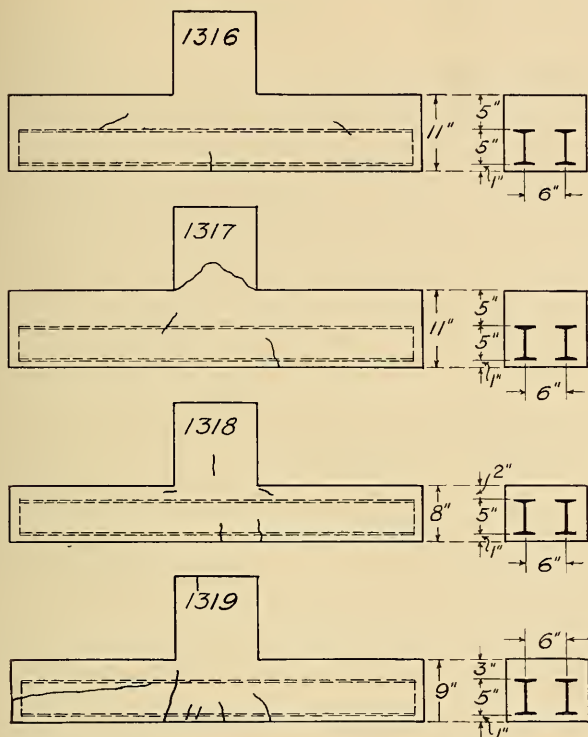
WALL FOOTINGS REINFORCED WITH I-BEAMS.
